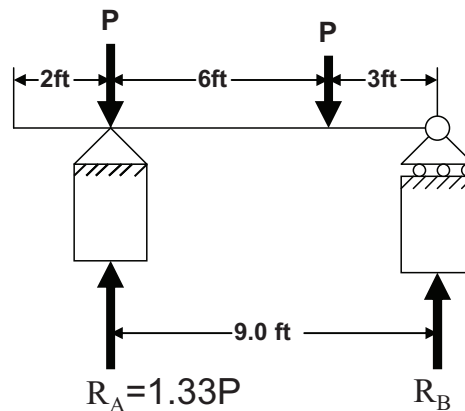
Exterior Girder Shear Distribution Factor
